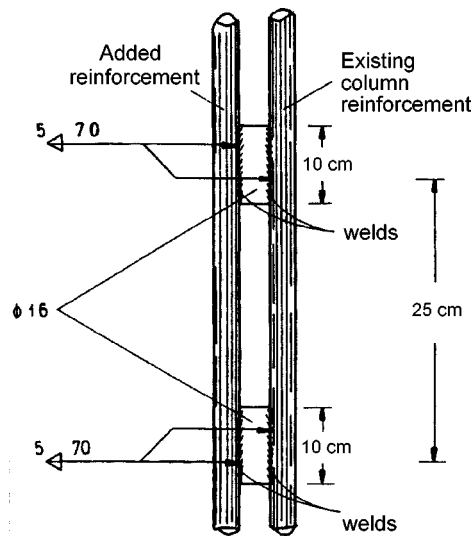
Welding of new reinforcement to existing column reinforcement
